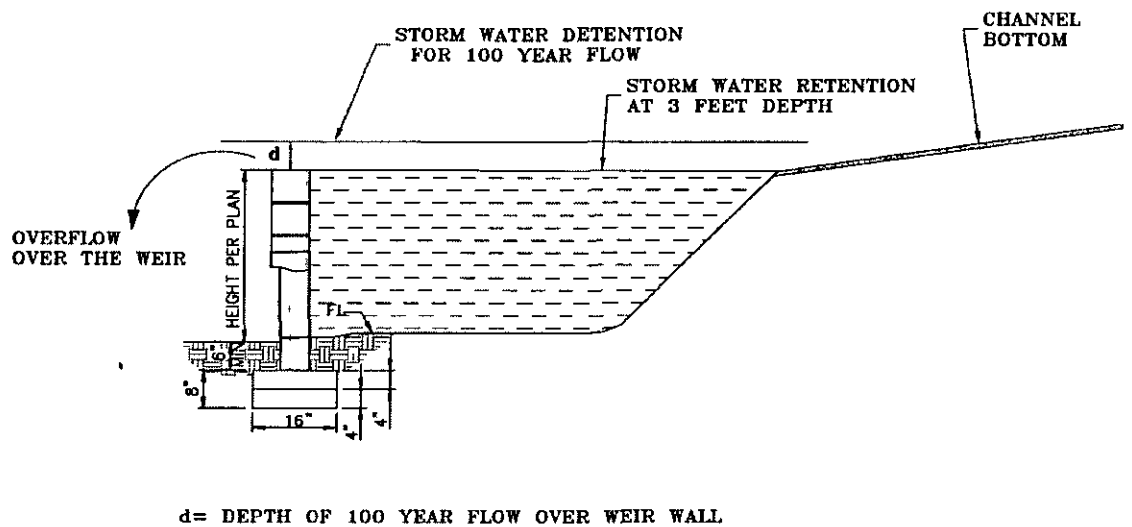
A- Weir Wall and Bleed Pipe at Headwall
